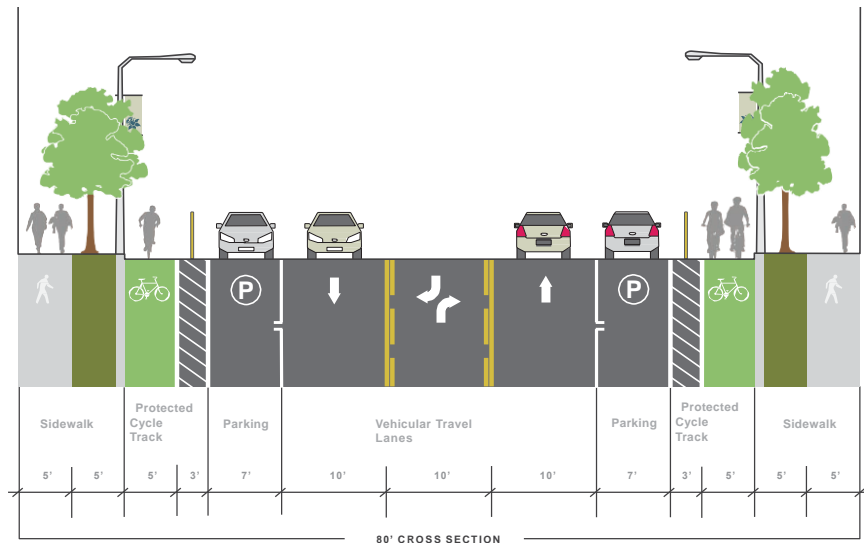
3-lane Streetscape with protected bike lane and buffered pedestrian access
